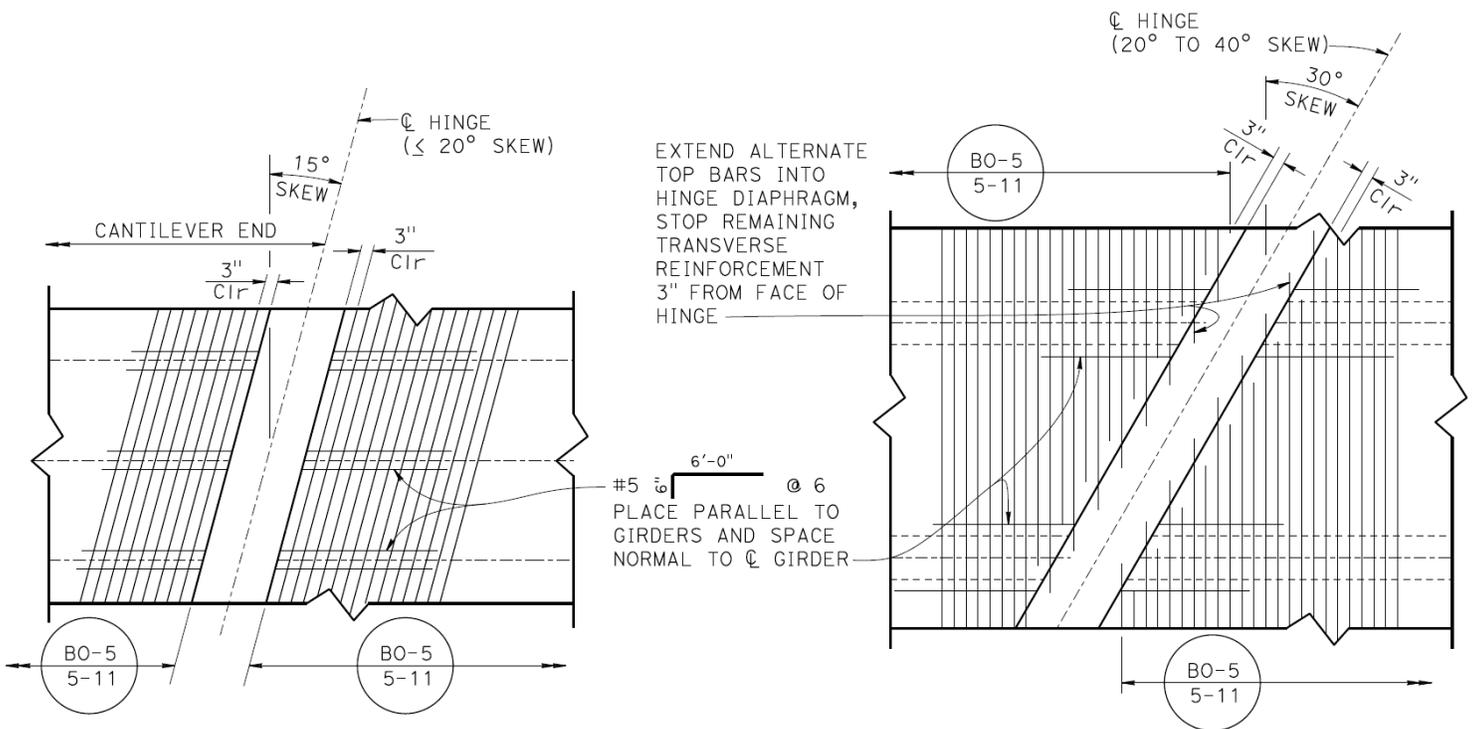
Transverse Deck Reinforcement Details at Hinge ($\leq 40^\circ$ Skew)
